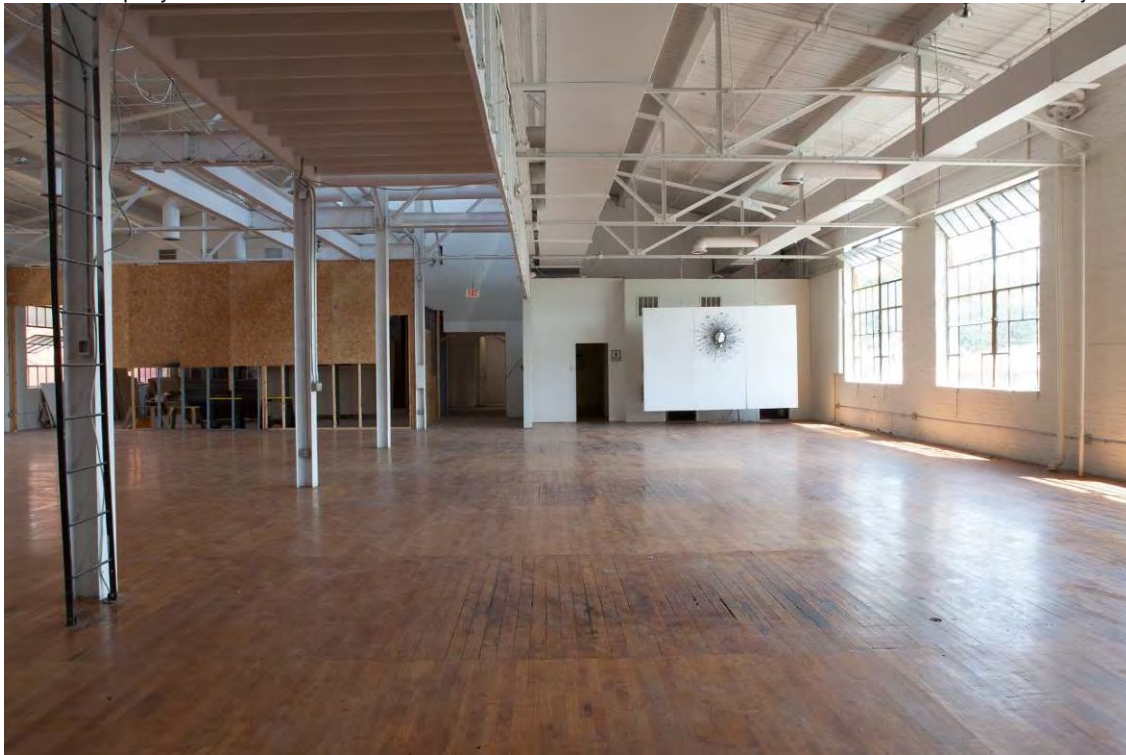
View of community kitchen under construction at northwest corner of the same space. Note operable sashes and open steel frame trusses.
